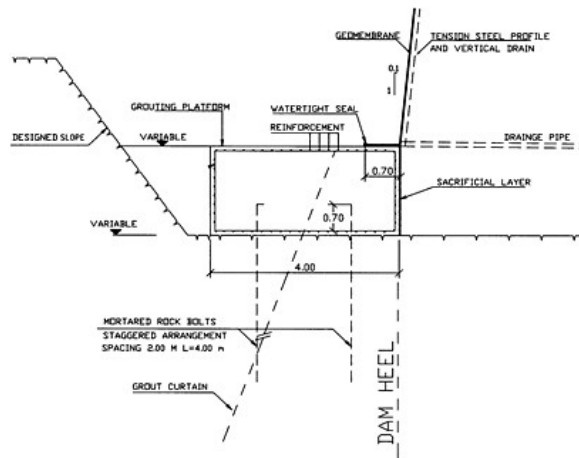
Concrete platform coupled with geomembrane for Mujib RCC dam.
